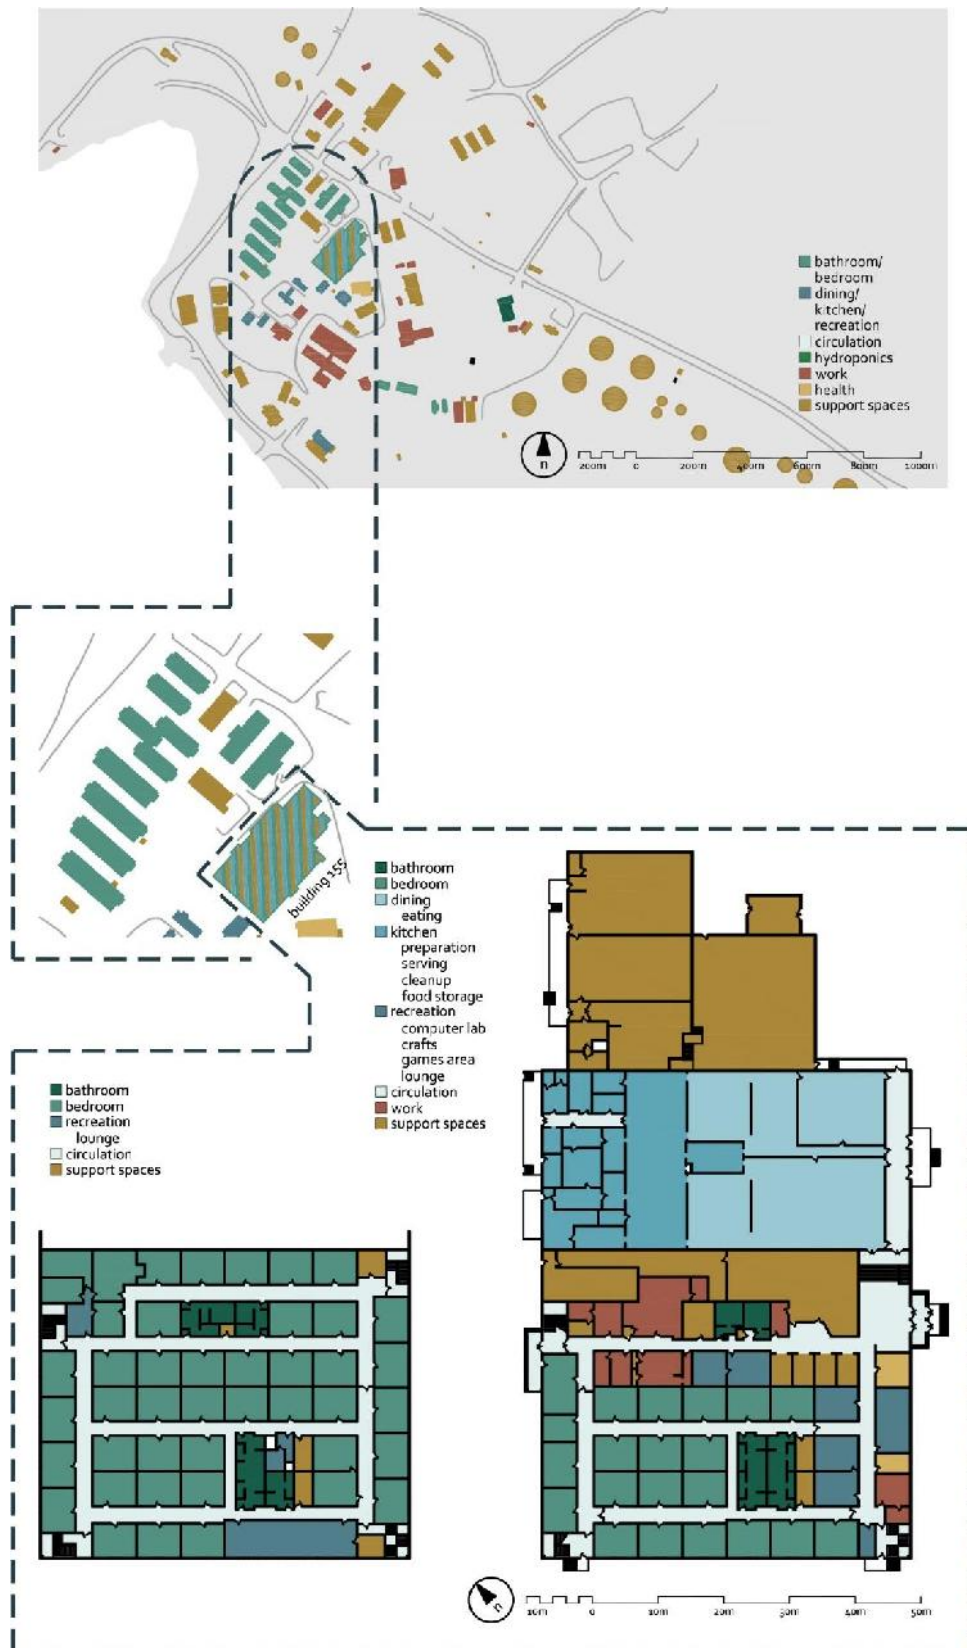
McMurdo Station's Building 155 – Site, Orientation, Floor Plan²⁰⁵
